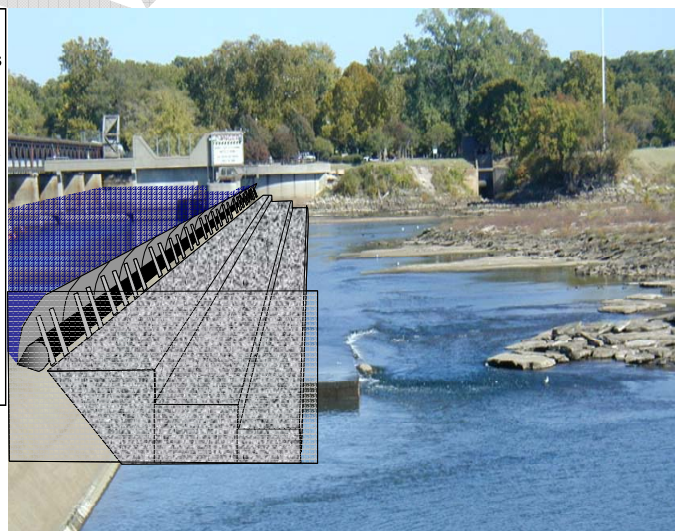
Conceptual Sketch of Zink Dam with Stepped Deck and Obermeyer Gate Retrofits
